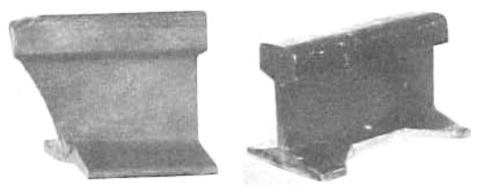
Foot vertical longitudinal split (Half moon crack)
